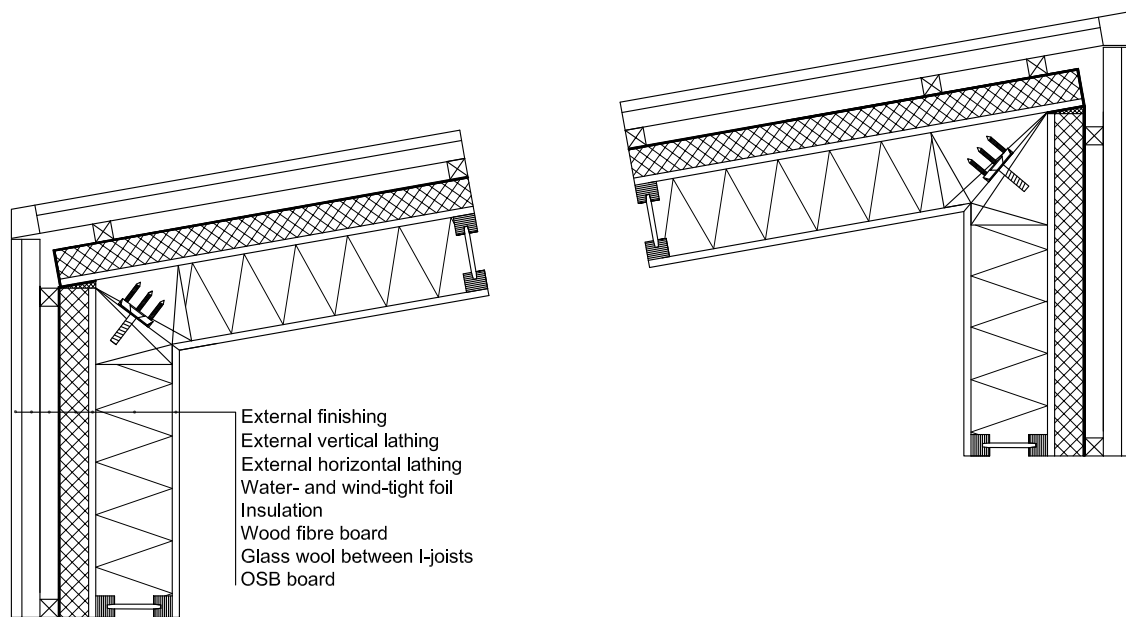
Horizontal section of corner connections between two prefabricated wall elements (non-perpendicular walls of existing building assumed). Connector systems for prefab walls are used (e.g. Knapp Walco®V).
